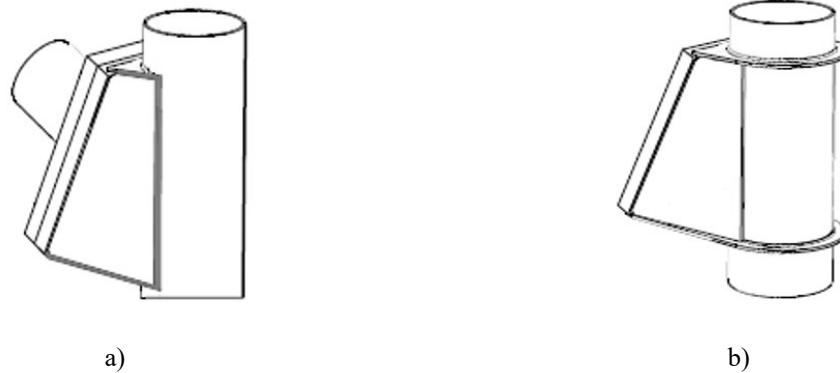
Standard Gusseted and Ring-Stiffened Box Connection Designs: a) Gusseted Box Connection and b) Ring-Stiffened Box Connection (AASHTO SLT 2015)
